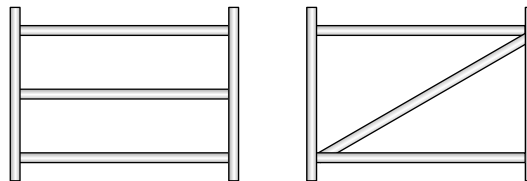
Configuration of Frame for Type 'A' Tower.
